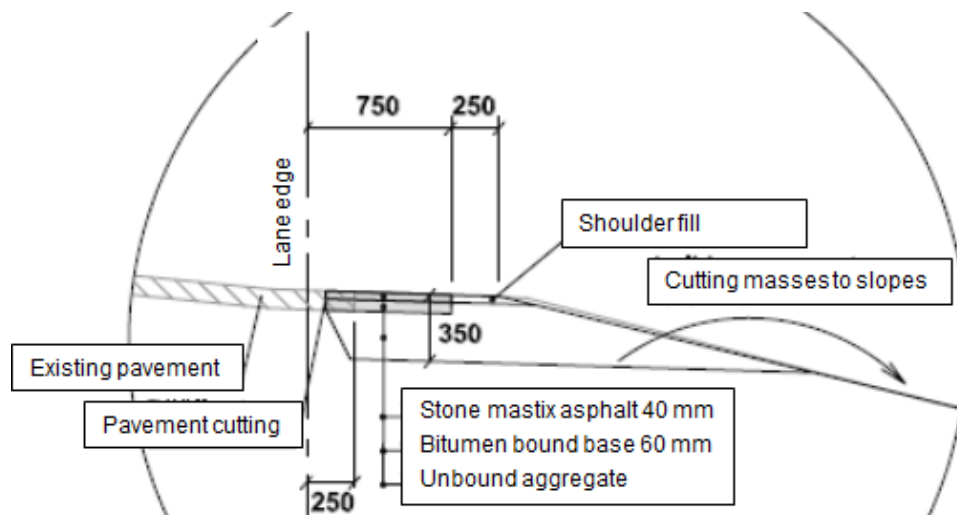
1. Detail drawing of the Hw 9 widening structure
